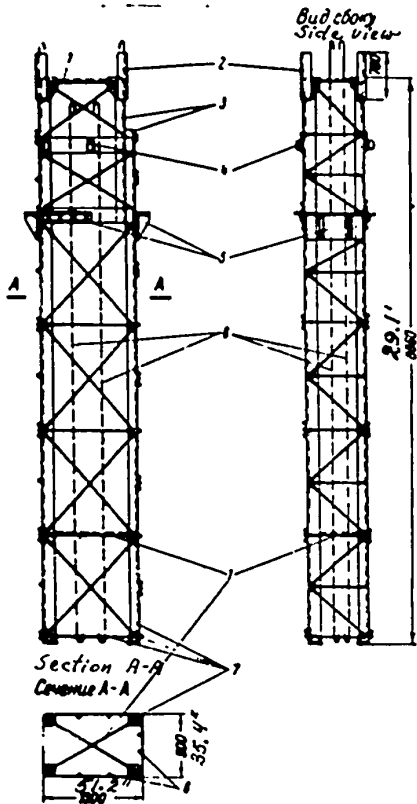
Rigid Welded Steel Skeleton Reinforcement of a Column.
